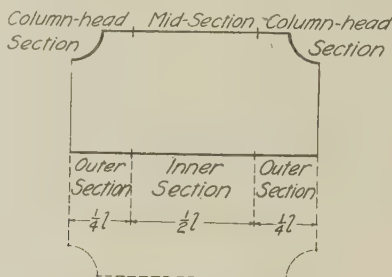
MOMENT SECTIONS FOR FLAT-SLAB PANELS.
